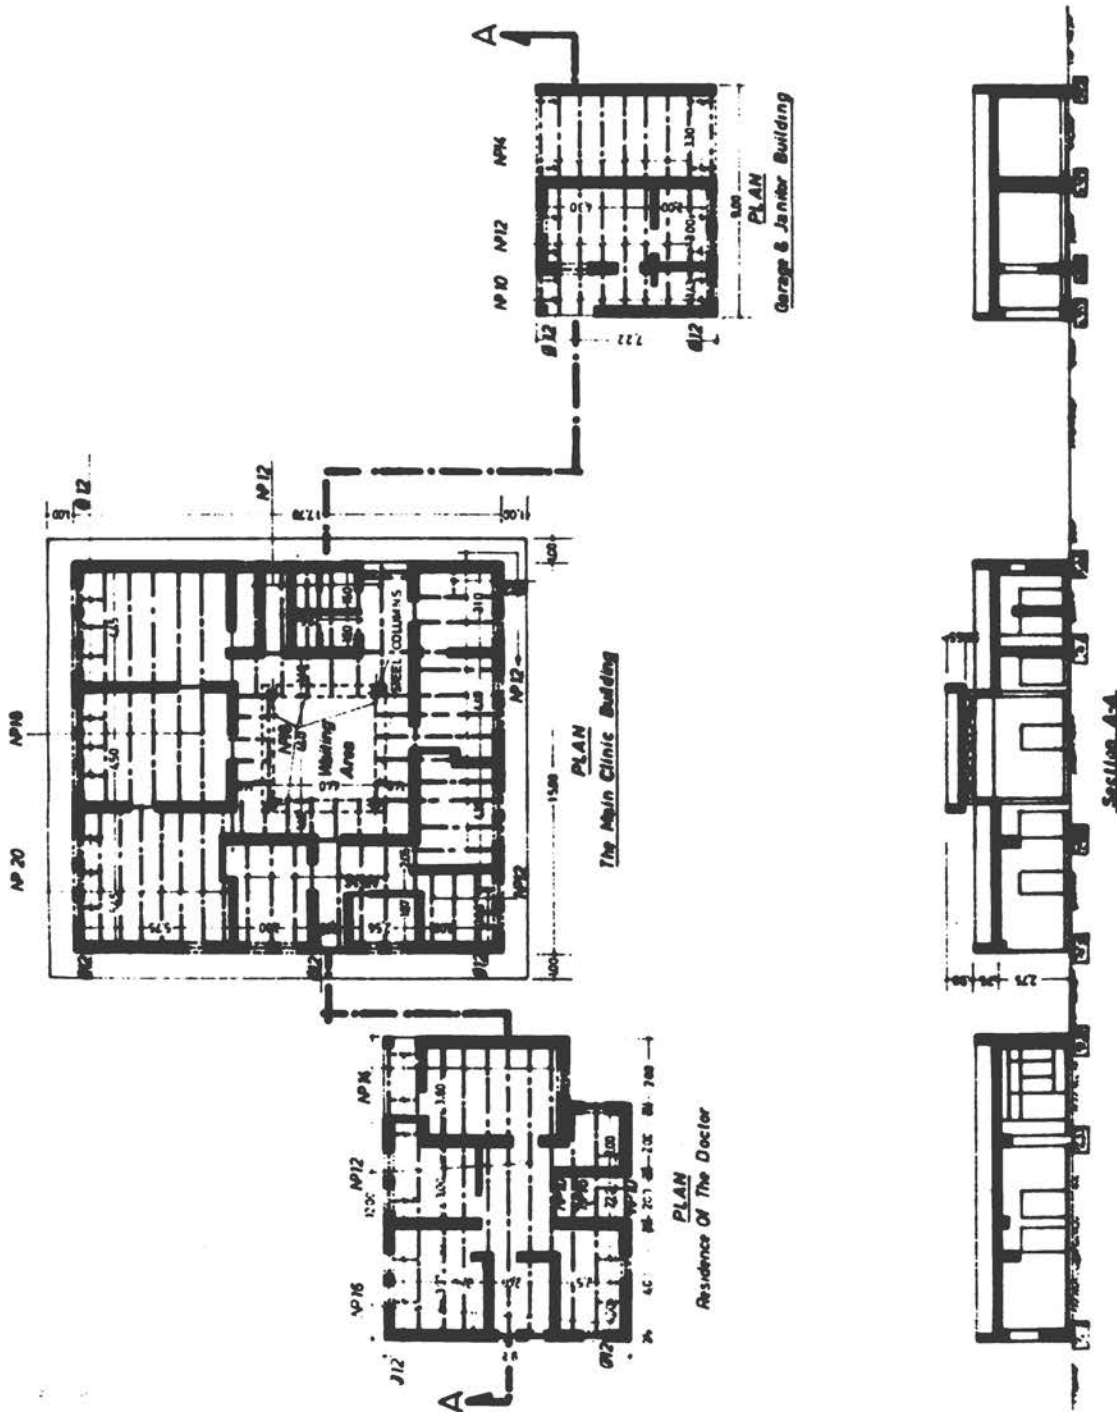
Clinic Buildings of the Town of Qir.
